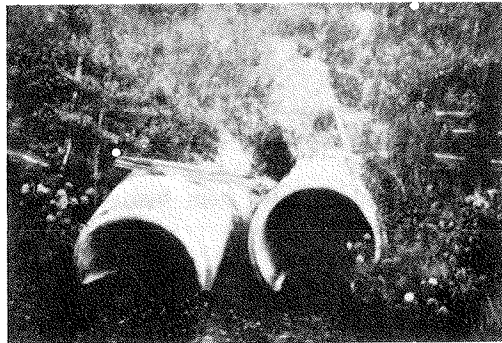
Void from piping along culvert barrel. Inadequate space between pipes for good compaction.
